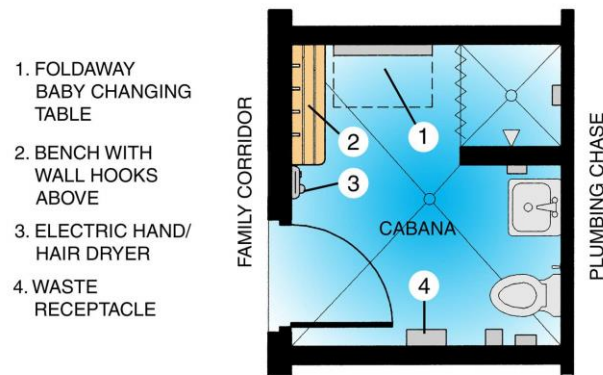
Example of Best Practice Floor Plan of Family Changing Room
